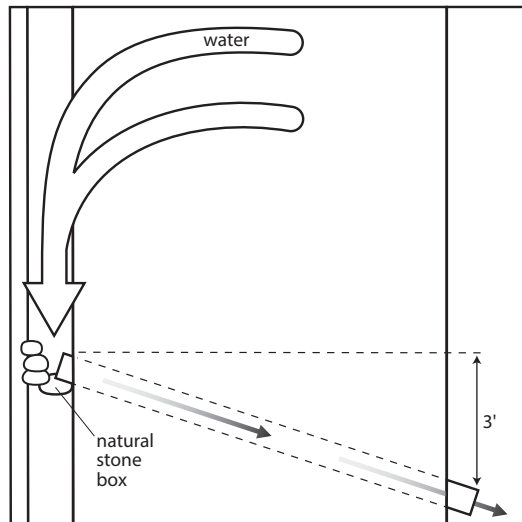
Top and side view diagram of culvert used to drain in-slope ditch.
